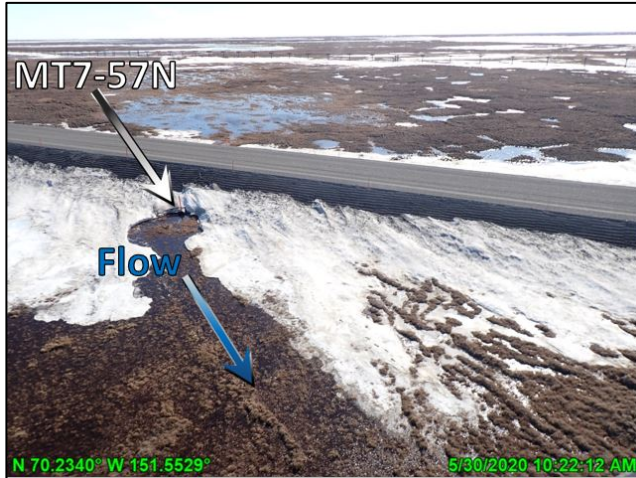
Flow through culvert MT7-57, looking south; May 30, 2020
